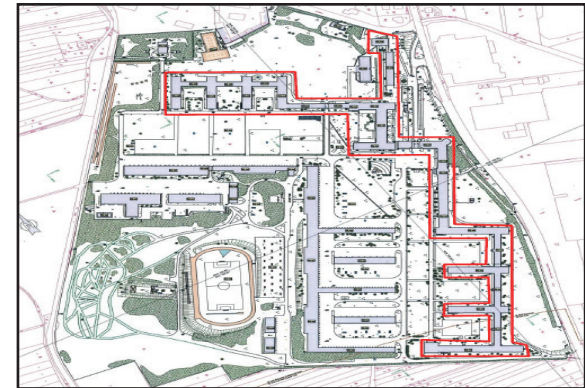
Overview plan of buildings structure with monument protected ensemble (SIVBEG, 2014)
